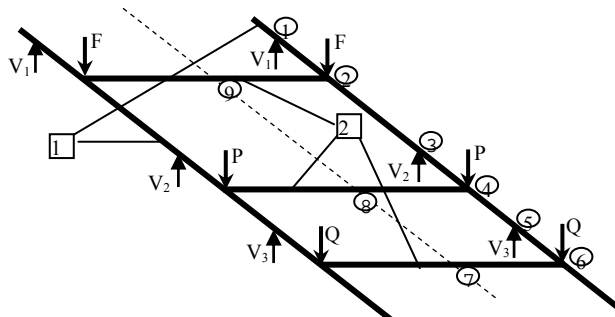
The geometry and loading scheme of the metallic structure [1]: 1 - longitudinal beams; 2 - transversal beams.
